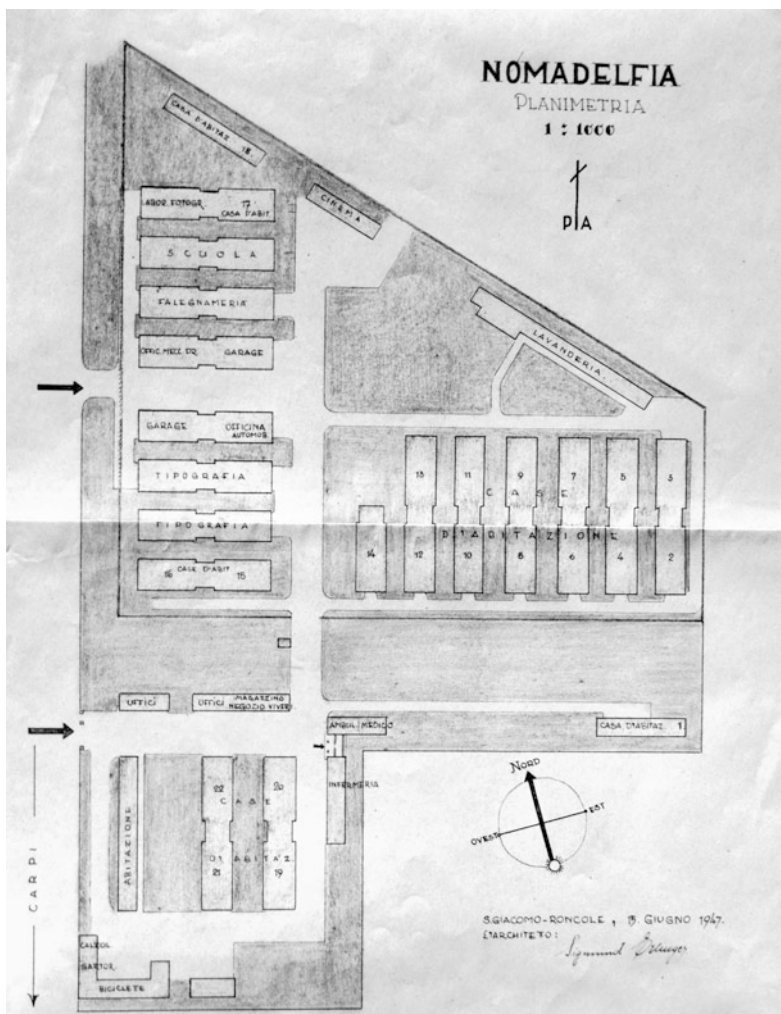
Reconstruction Plan to Transform “New Camp” into Nomadelfia
